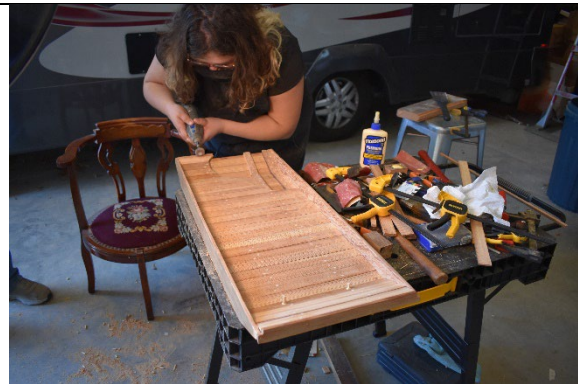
Saldivar using Dremel to sand hard edges on header near cut out (Photo by Michaela Hoots).
